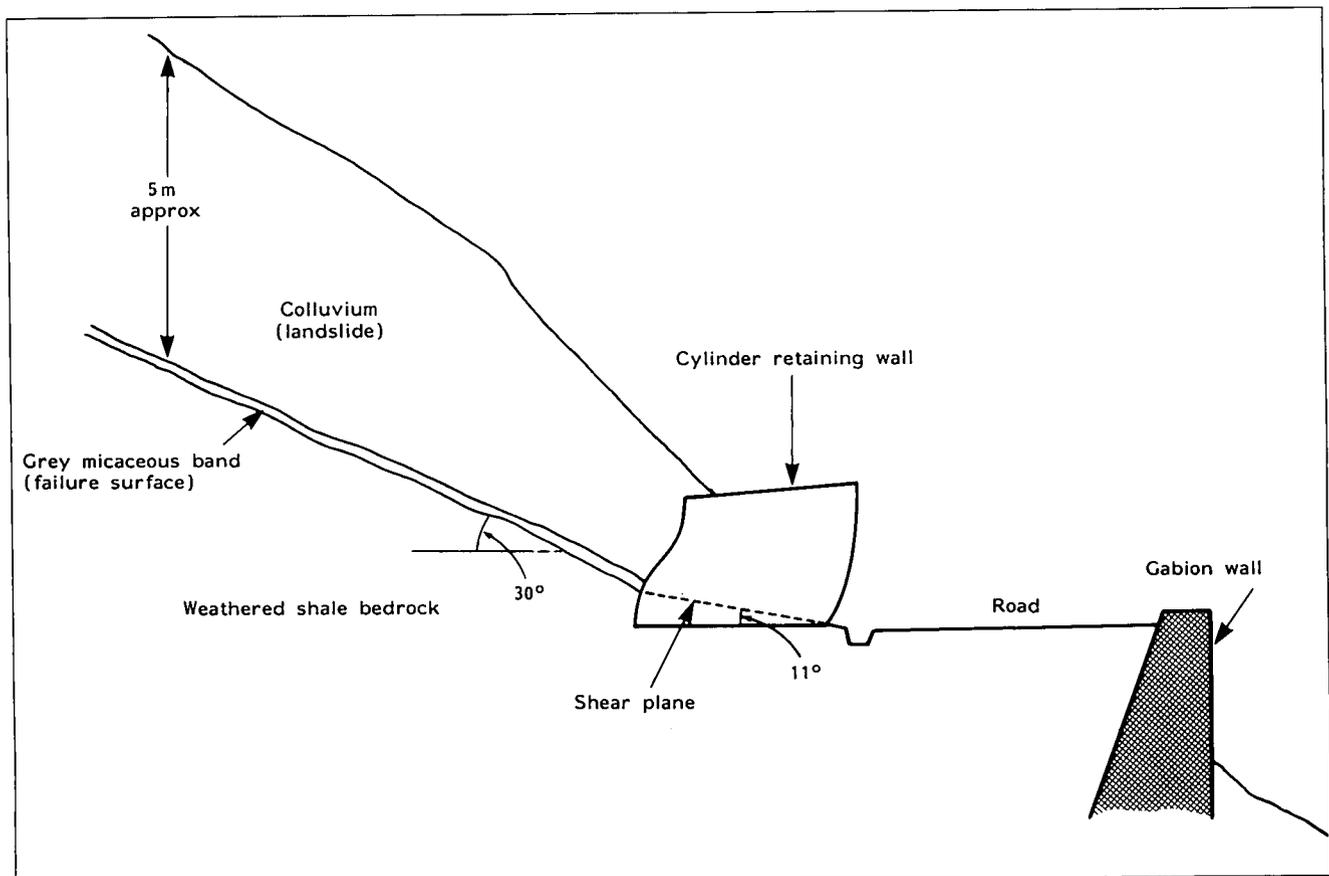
Section through landslide and cylinder wall with unstabilized fill
